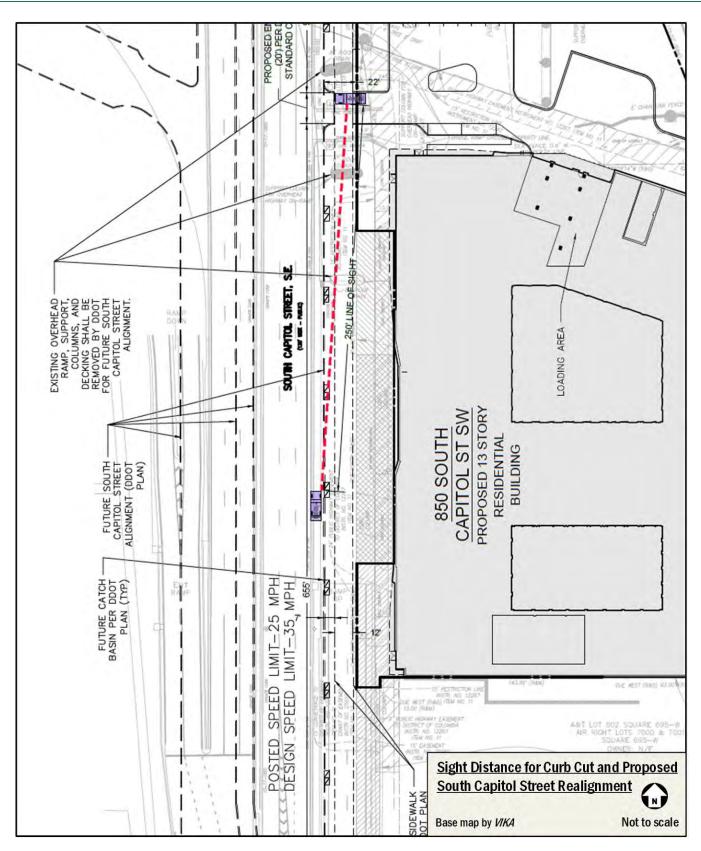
Sight Distance for Curb Cut and Proposed South Capitol Street Realignment
